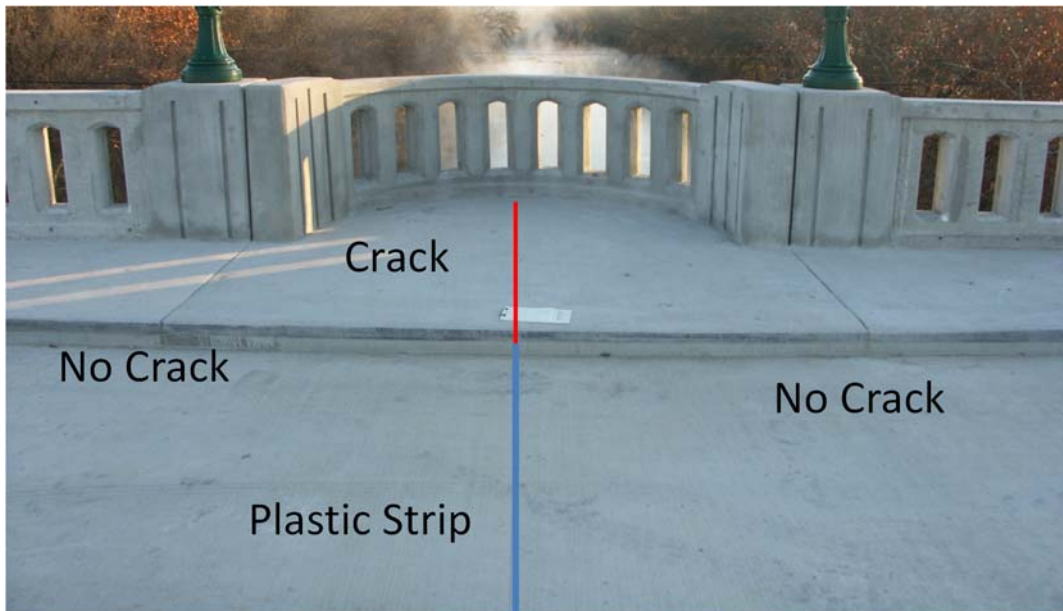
Transverse cracking in sidewalk concrete.
